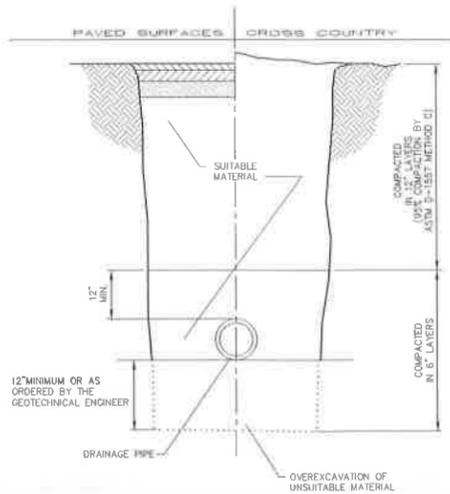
DETAIL SHEET - GENERAL SITE (MAP 221, LOT 1)
